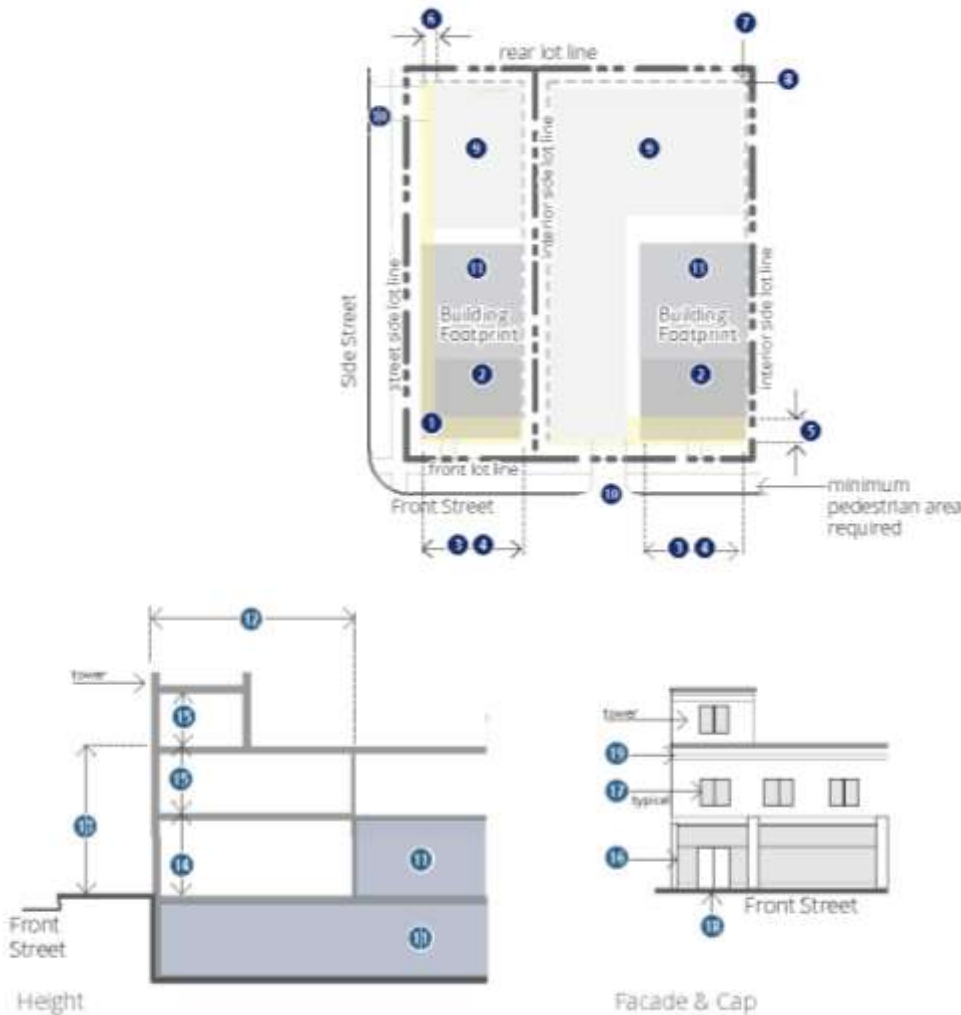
(4). NMU district diagrammatic plans and elevations.
